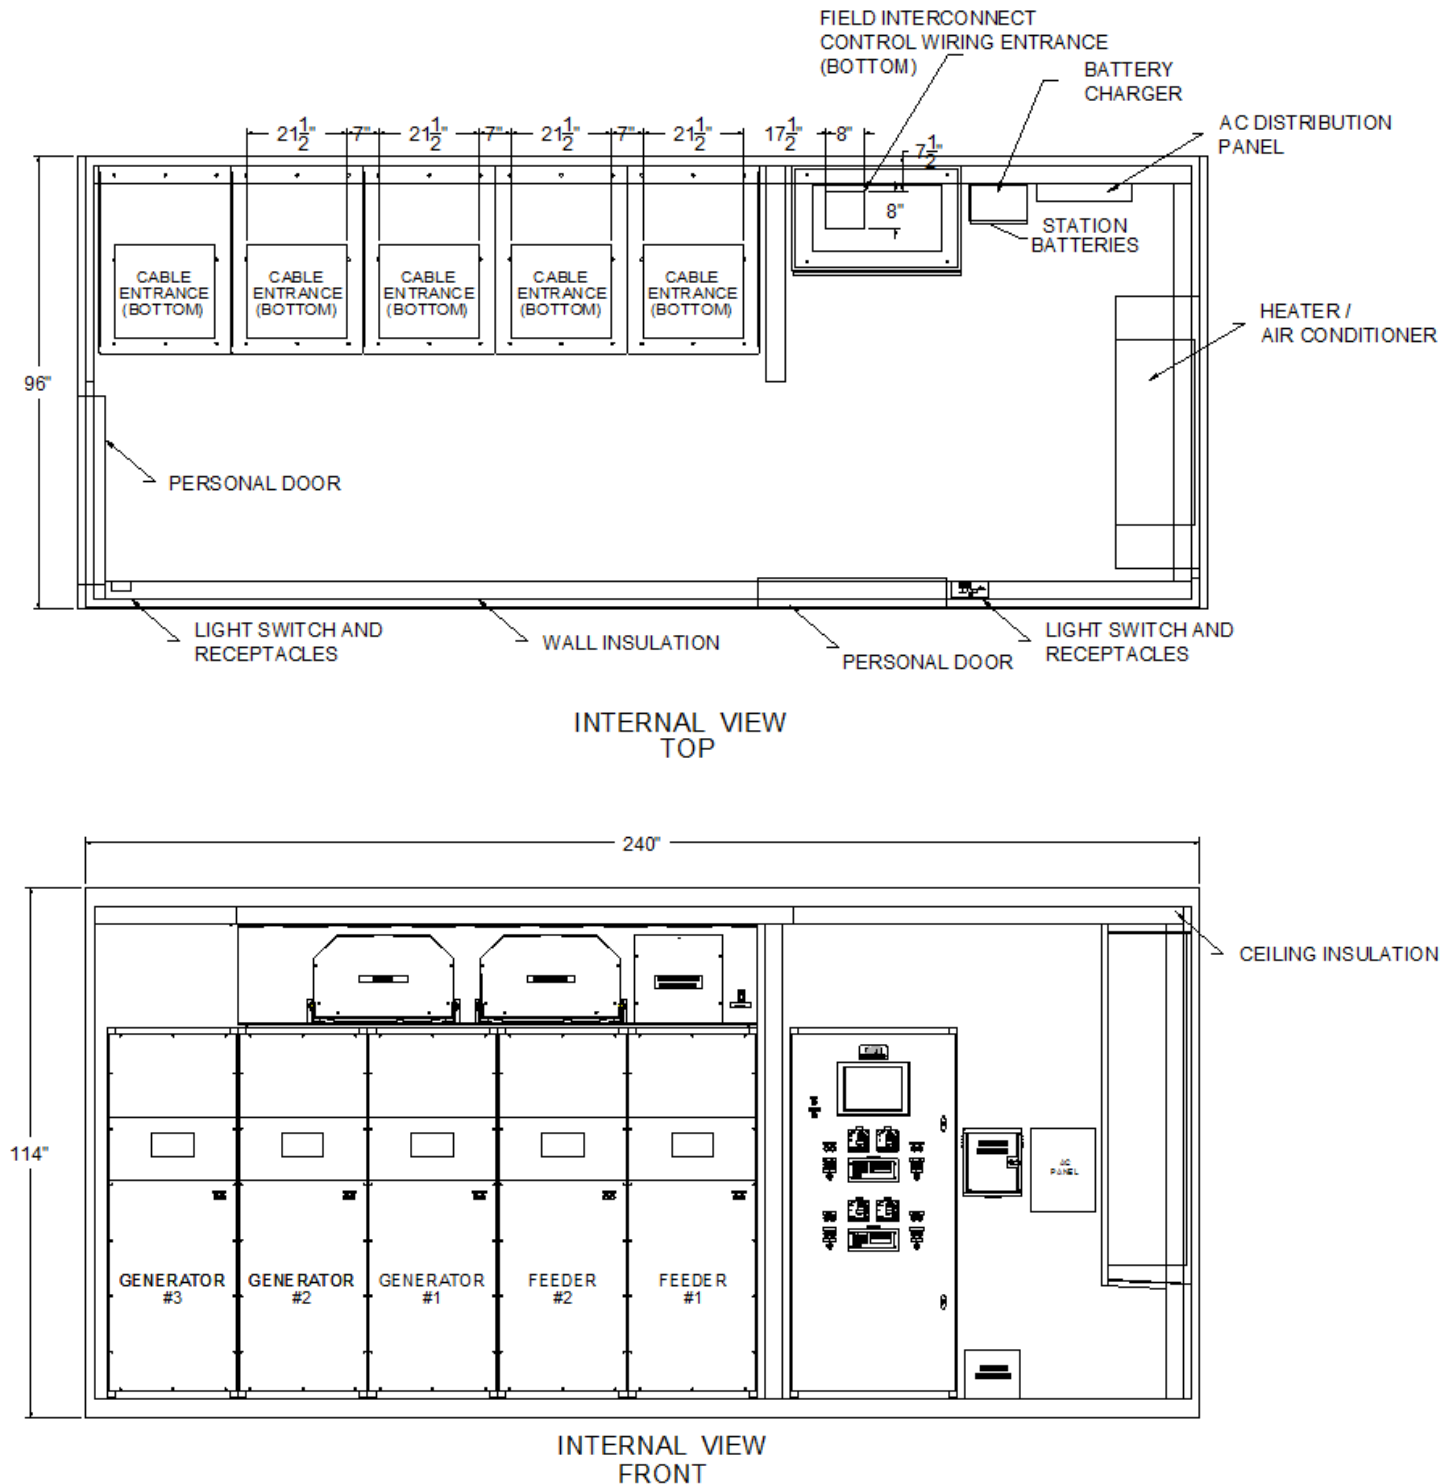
5-15 kV Metal-enclosed Switchgear Front, Side, & Top Views – Dimensions
